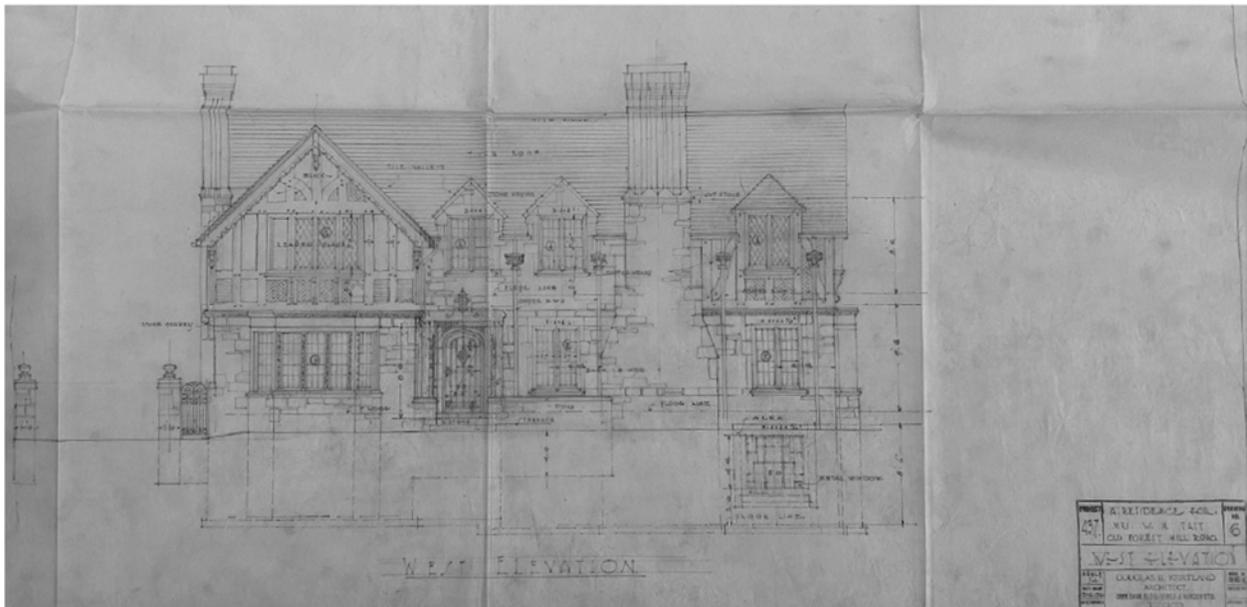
1934 architectural drawing by Douglas Kertland, showing the west elevation of the subject property. (Building Records)
